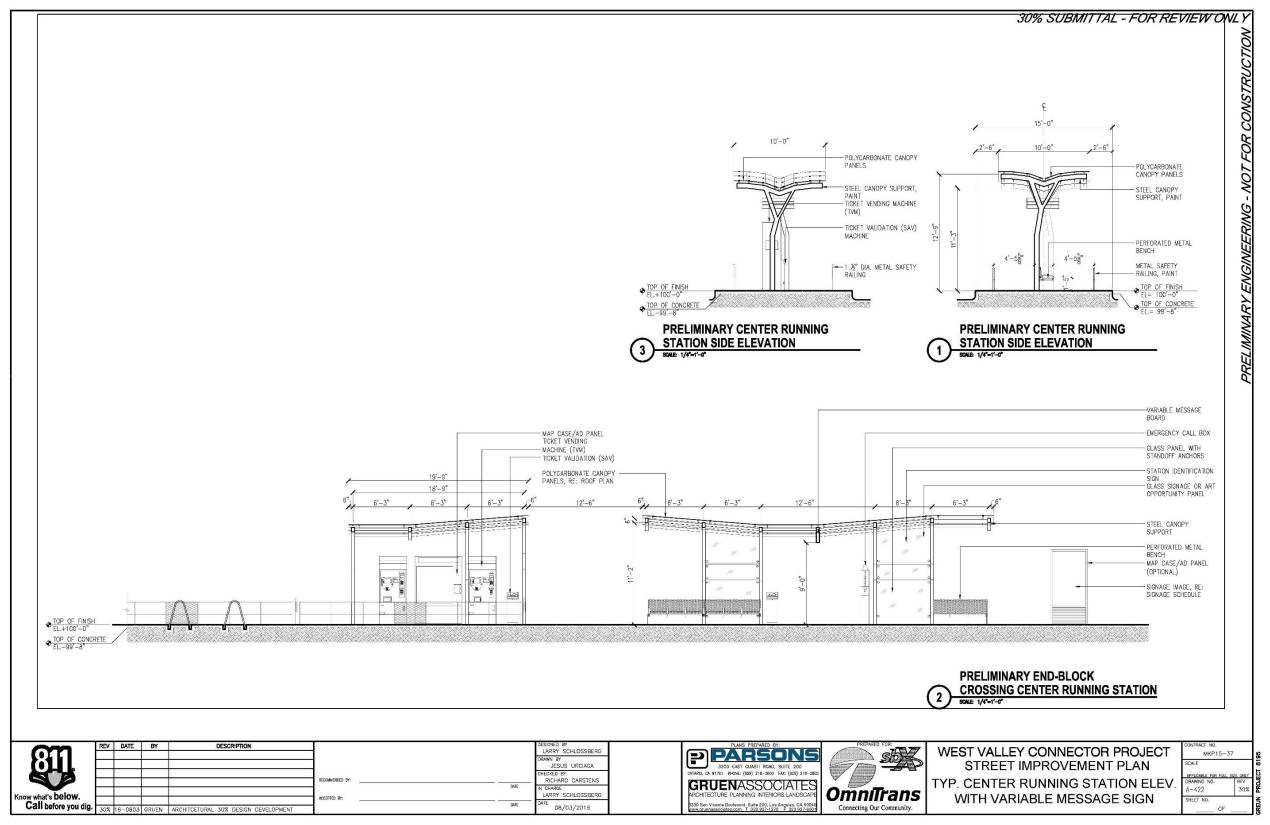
Center-Running Station Elevation (Alternative B Only)
